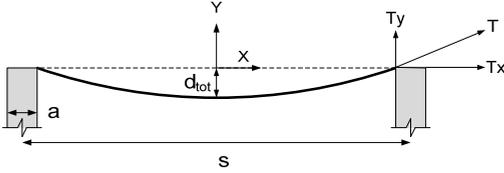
Parabolic approximation for reinforcement spanning adjacent columns
